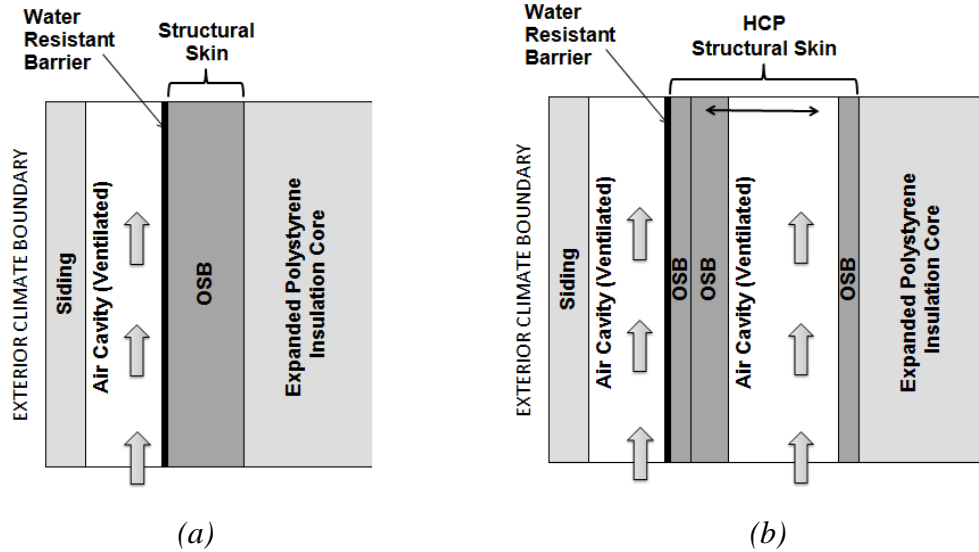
Increased drying potential depiction. Traditional SIP construction at the exterior layers is shown with a ventilated air cavity in (a). The proposed SIP construction at the exterior layers is shown with a ventilated air cavity at both the drainage plane and HCP core in (b). The vertical arrows shown depict the movement of air. The inclusion of the HCP core allows for greater surface area exposure to the drying affects of ventilated air and a greater drying potential at the OSB and expanded polystyrene interface by reducing the thickness of the OSB material against the expanded polystyrene.
